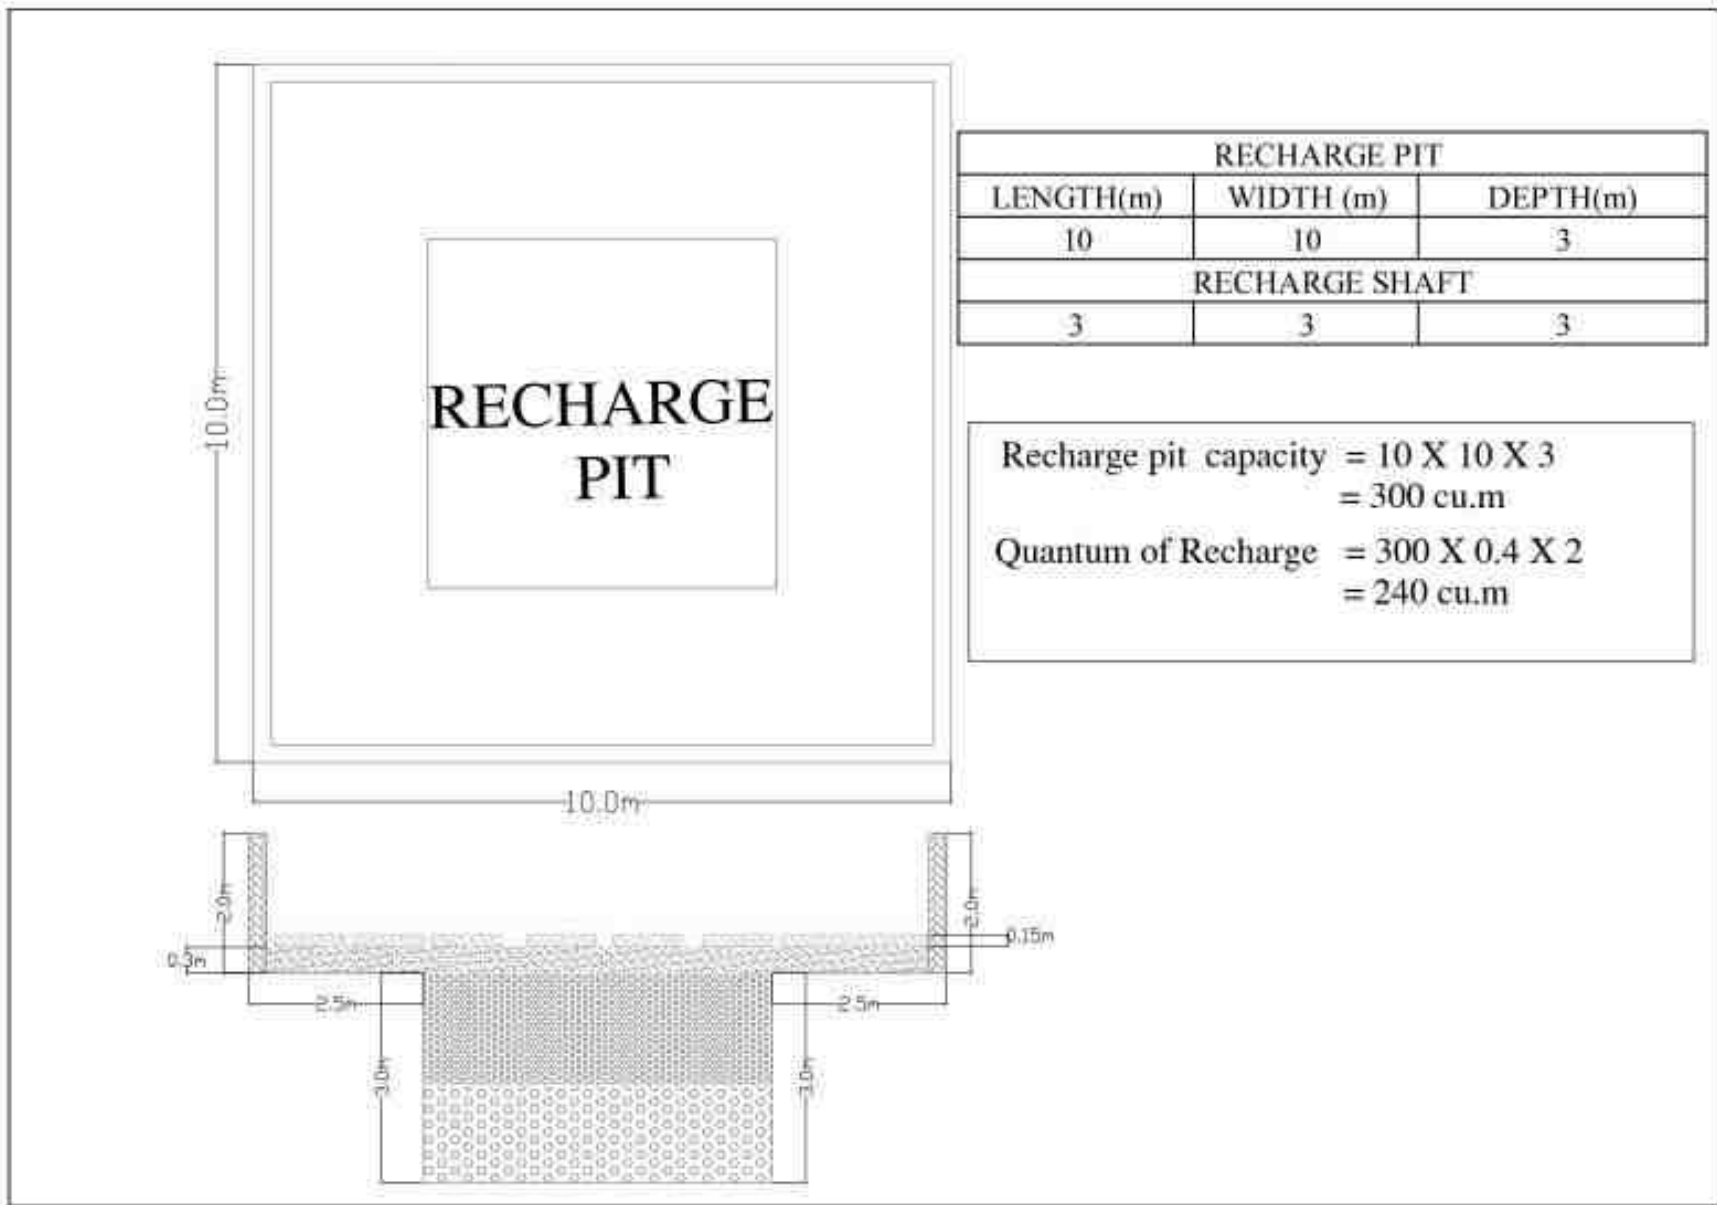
Recommended recharge pit dimension and cross section view of the recharge structures
